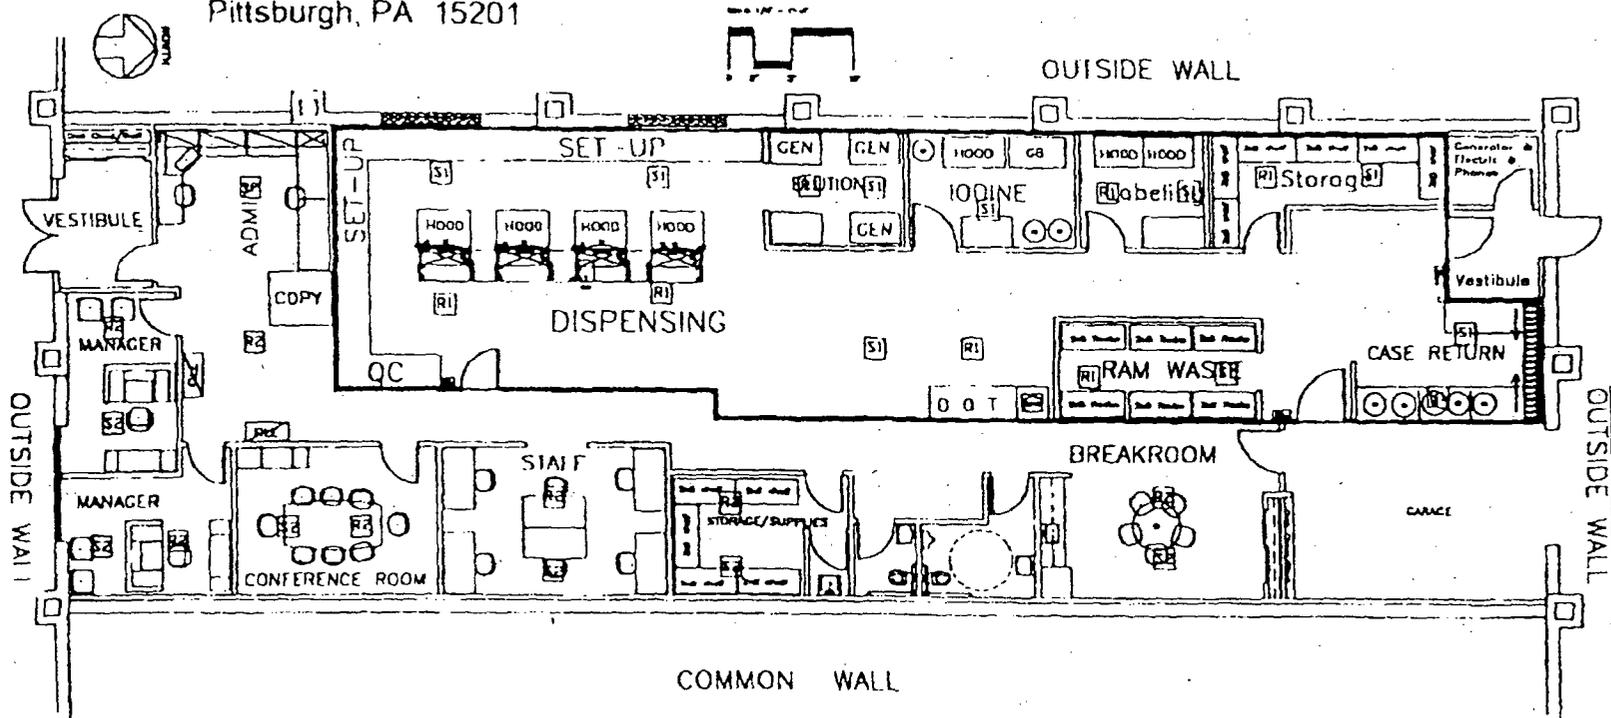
Facility Floor Plan. The restricted area is outlined in black.
